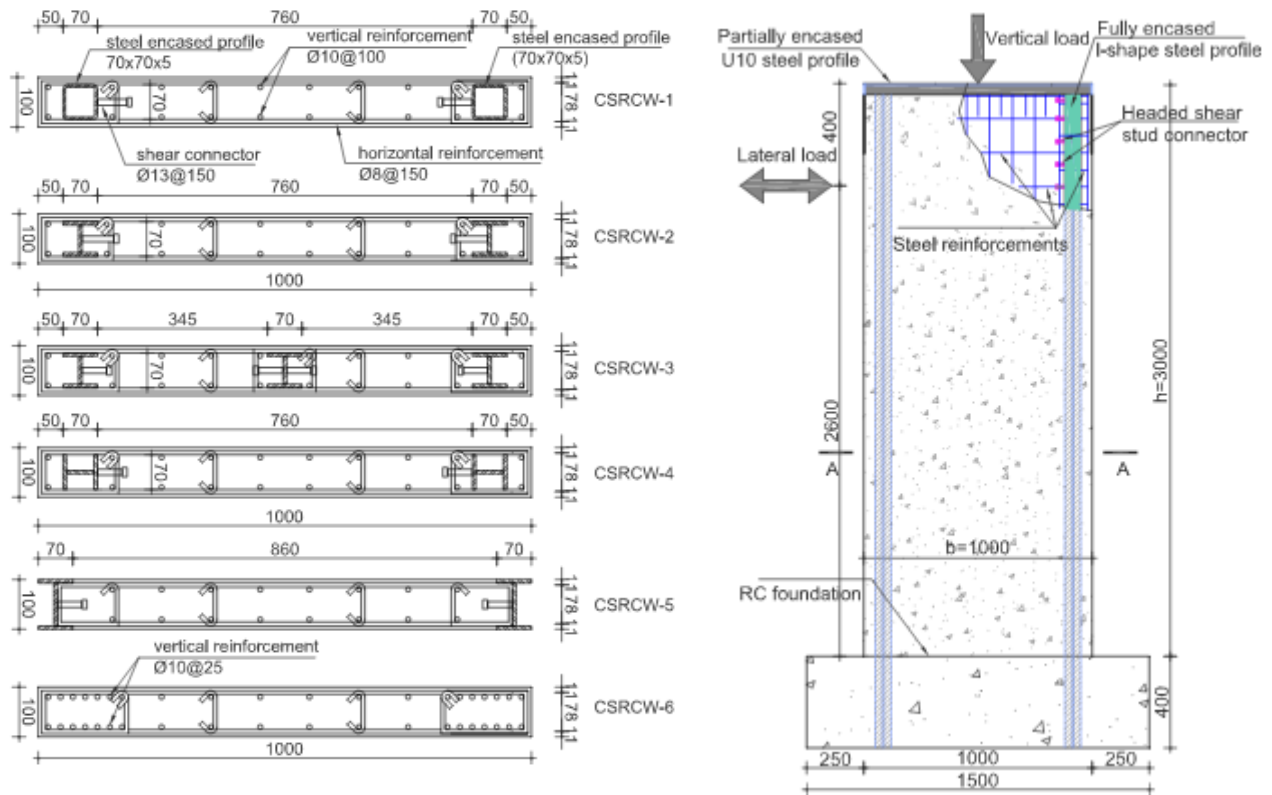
Tested Composite Reinforced Concrete Wall Specimens, Dan et al. (2011)
